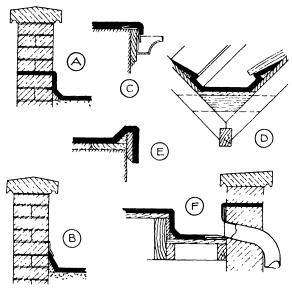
Rock asphalt roof coverings. A. Skirting against and damp course through wall. B. Metal flashing to asphalt. C. Discharge to eaves gutter with metal drip. D. Valley gutter to tiled roof. E. Detail at verge. F. Parapet gutter with pipe outlet.
